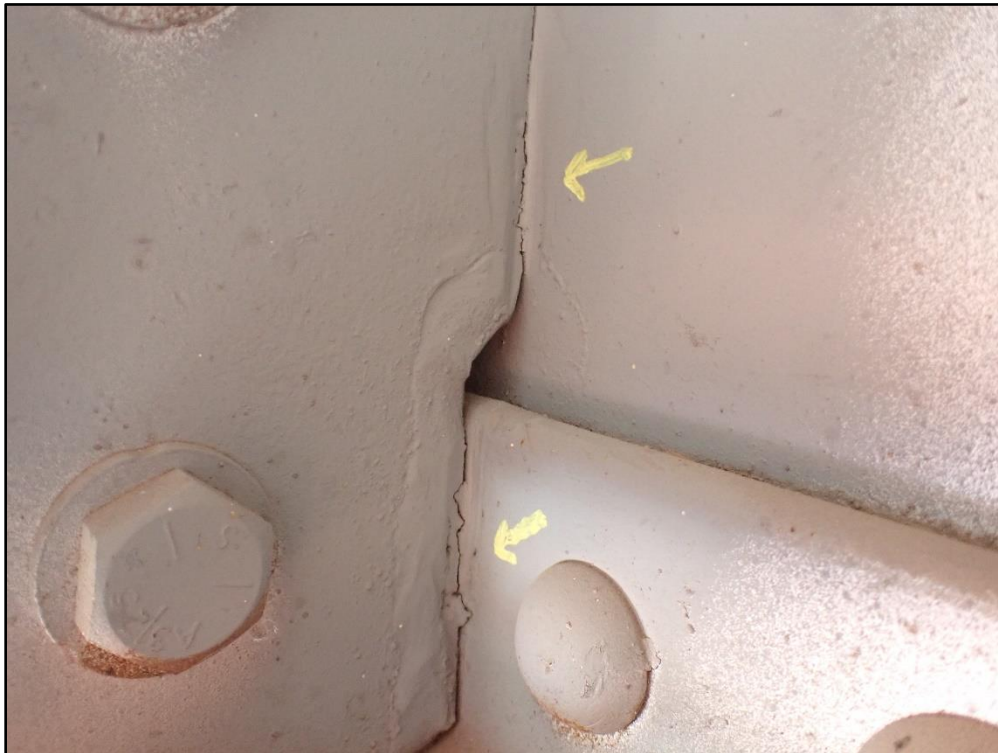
SA Cracked Tack Welds – Girder C North Face – Stiffener 26 to Vertical Leg of Bottom Flange and Web
